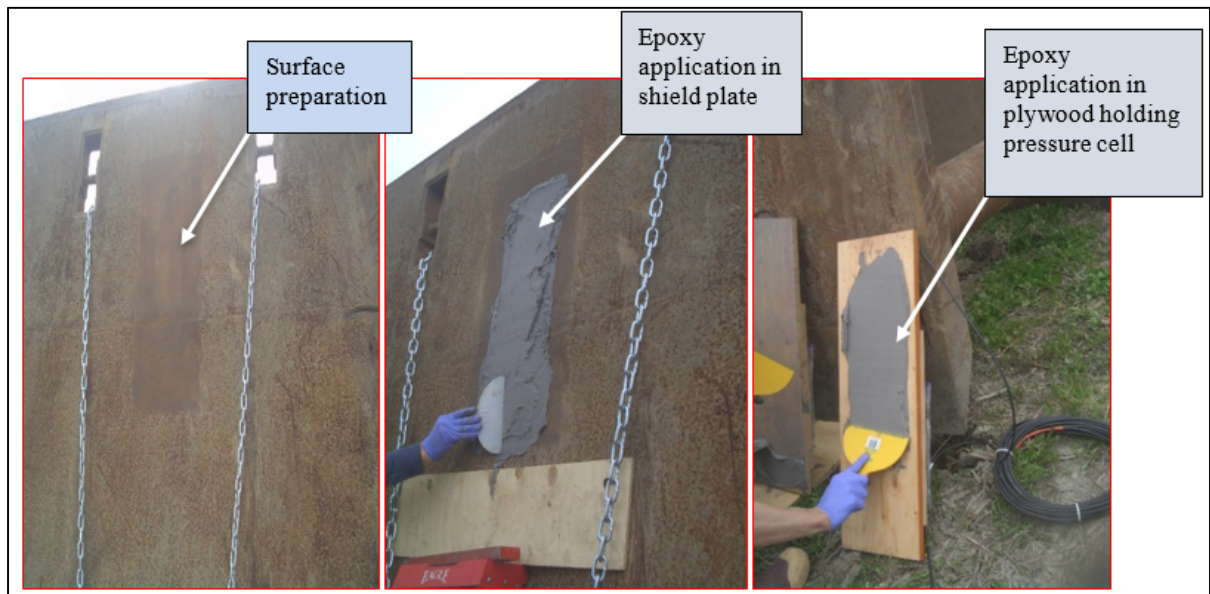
Steps to install the pressure cells on the steel wall plate of the trench box
